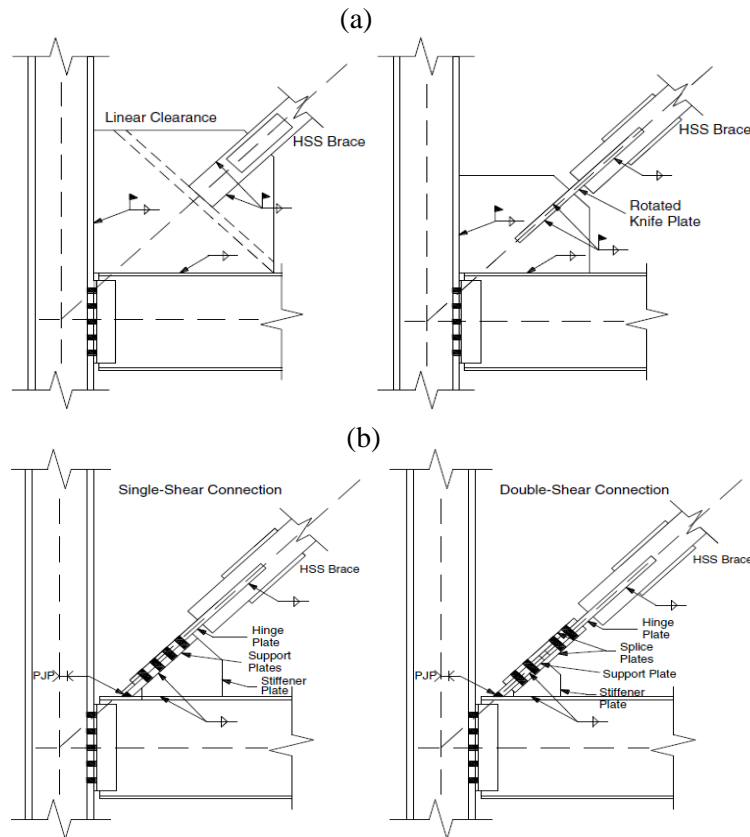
(a, b) the conventional and new suggested gusset plate for low damage concentrically braced frames [105]
